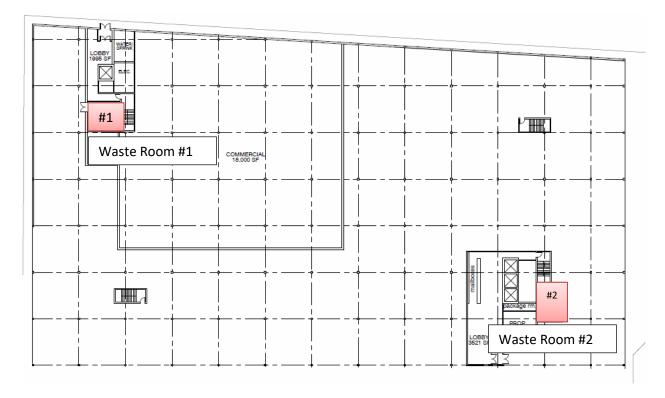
NORTH BUILDING WASTE COMPACTOR ROOMS
